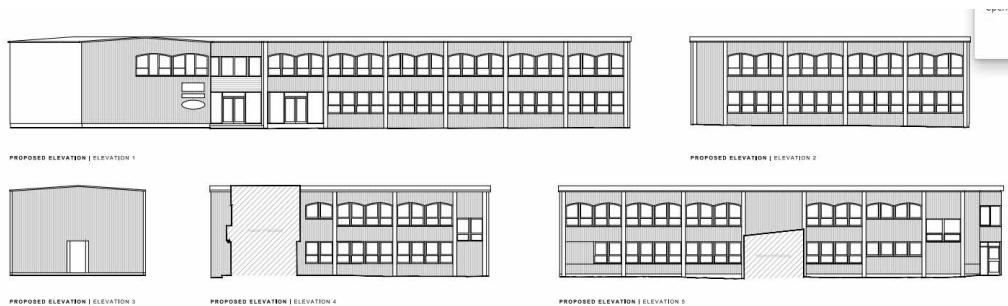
Proposed elevations of assessed building 1 – drawing 1600529.2.20 Drawn by AC by Marrons Planning
